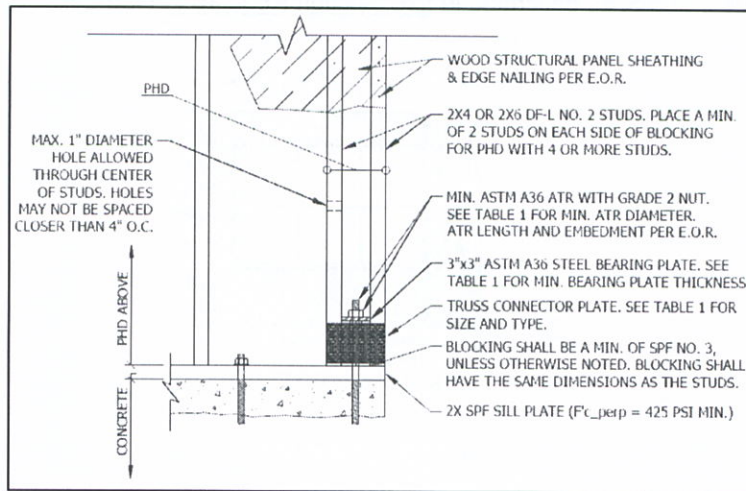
Typical Detail for a PHD Used as a Hold-Down Device for a Braced Wall Panel or Segmented Shear Wall
